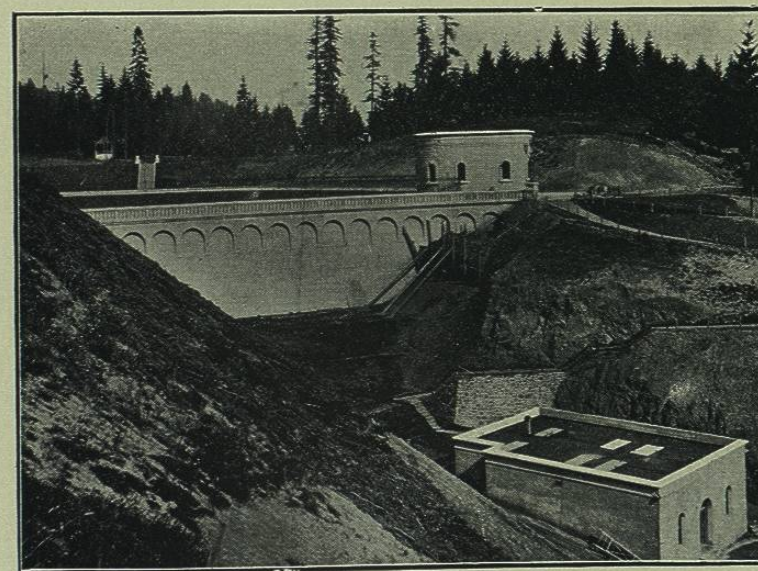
CONCRETE DAM, 60 FEET HIGH, AT RESERVOIR NO. 3, PORTLAND, ORE. POWER-HOUSE IN FOREGROUND.
